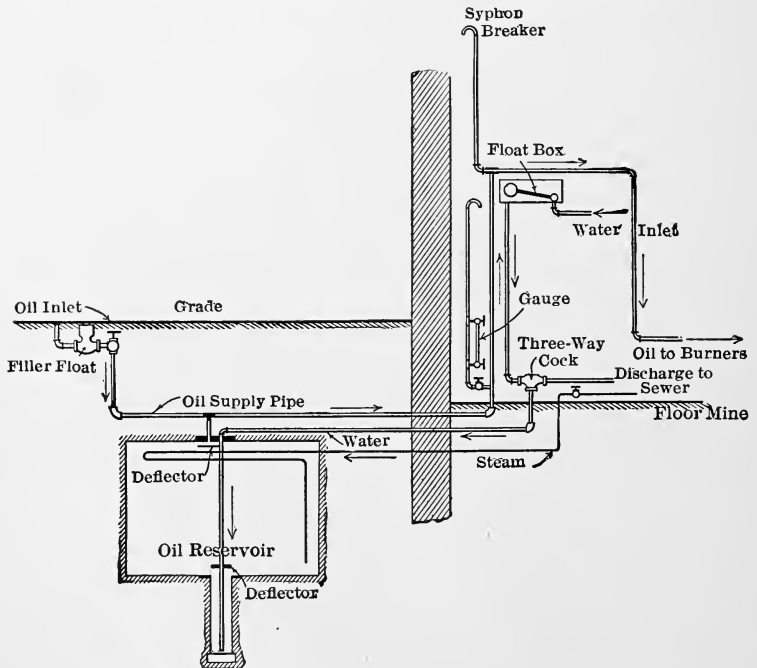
Hydraulic Oil Storage Company's Fuel-oil System.
